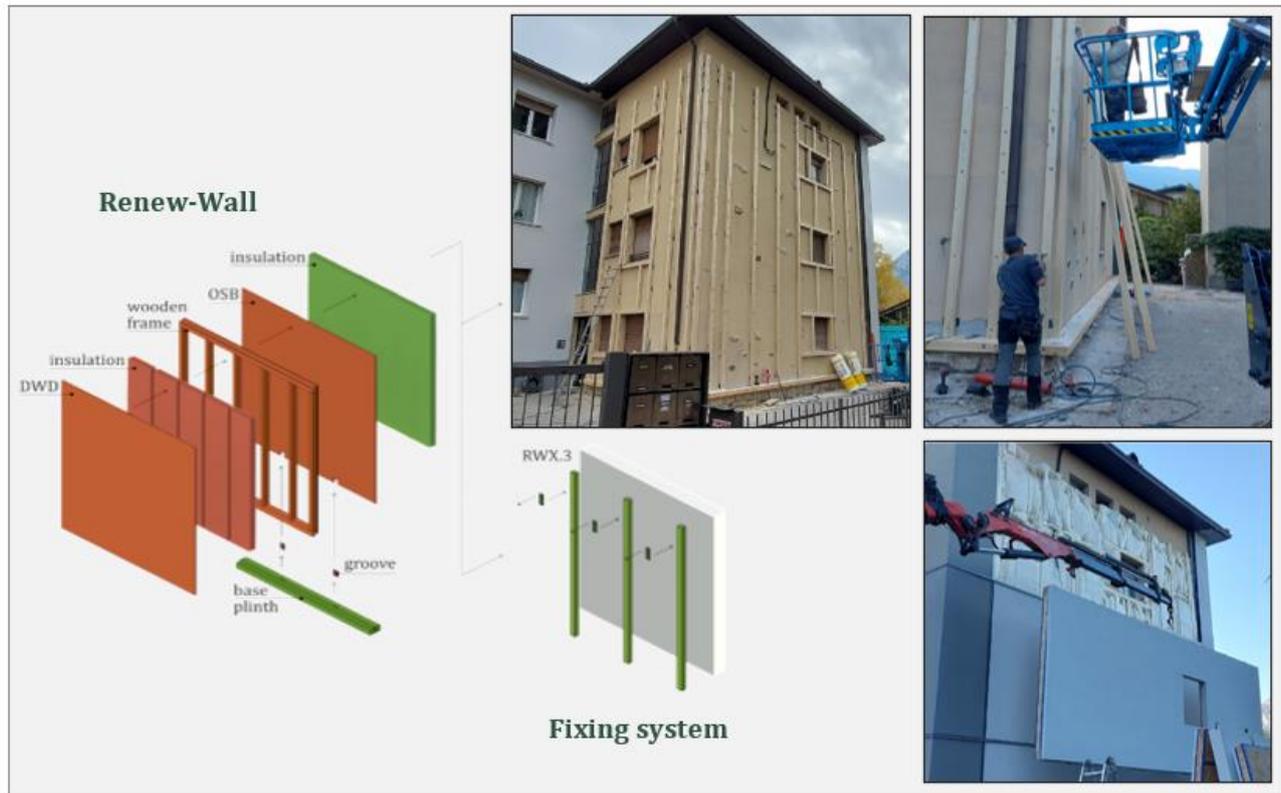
System for fixing the Renew-Wall to the Existing Building facade: schematics of the system (on the left and bottom center); photos of the installation - Demo Project Trento, Povo District (on the top centre and right)
